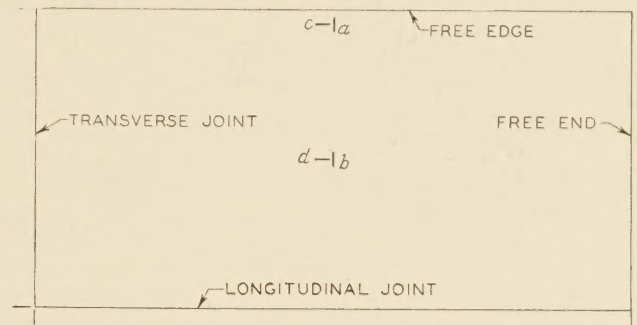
PLAN OF 10- BY 20-FOOT SECTION SHOWING LOCATION OF THE FOUR TYPICAL STRAIN GAGES REFERRED TO IN THE DESCRIPTION OF THE METHOD OF DETERMINING RESTRAINED WARPING STRESS.
